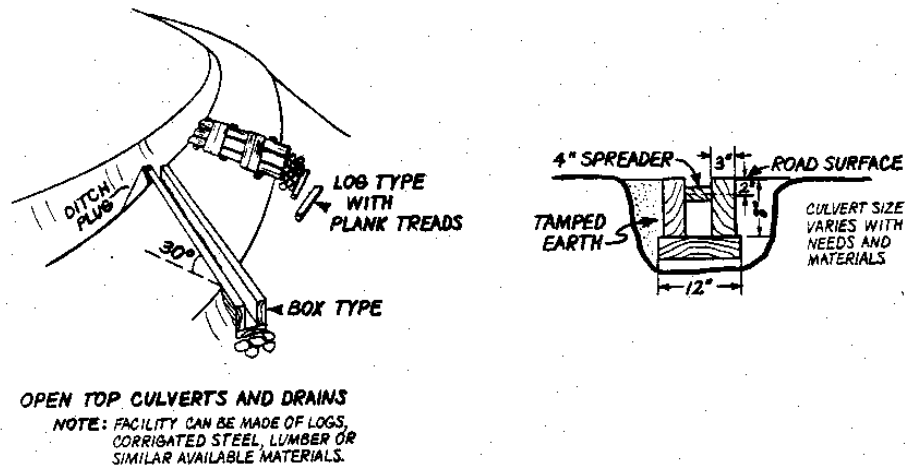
Installation of an open-top culvert. Culverts should be slanted at 30 degrees downslope to help prevent plugging. Structure can be made of corrugated steel, lumber or other, similar material. (Darrach, et al., 1982)
